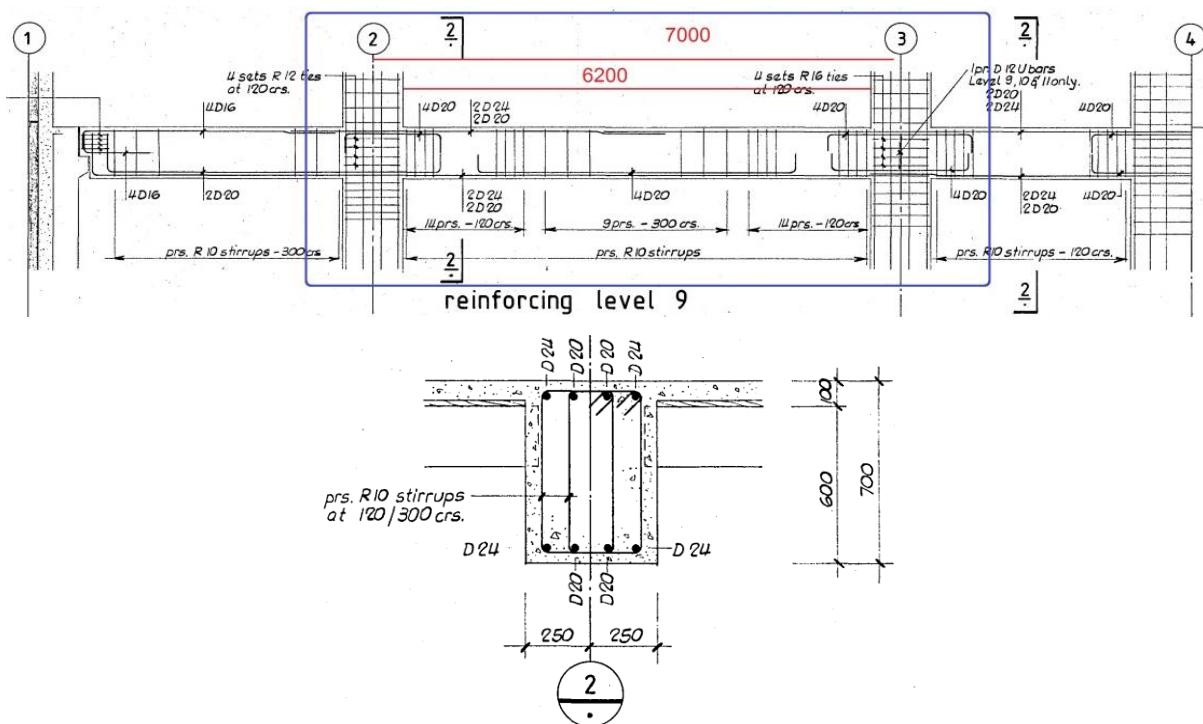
Reinforcement detail of a post-1980s RC beam (86 Gloucester Street, Brannigans, Christchurch, New Zealand; courtesy of Christchurch city council)
